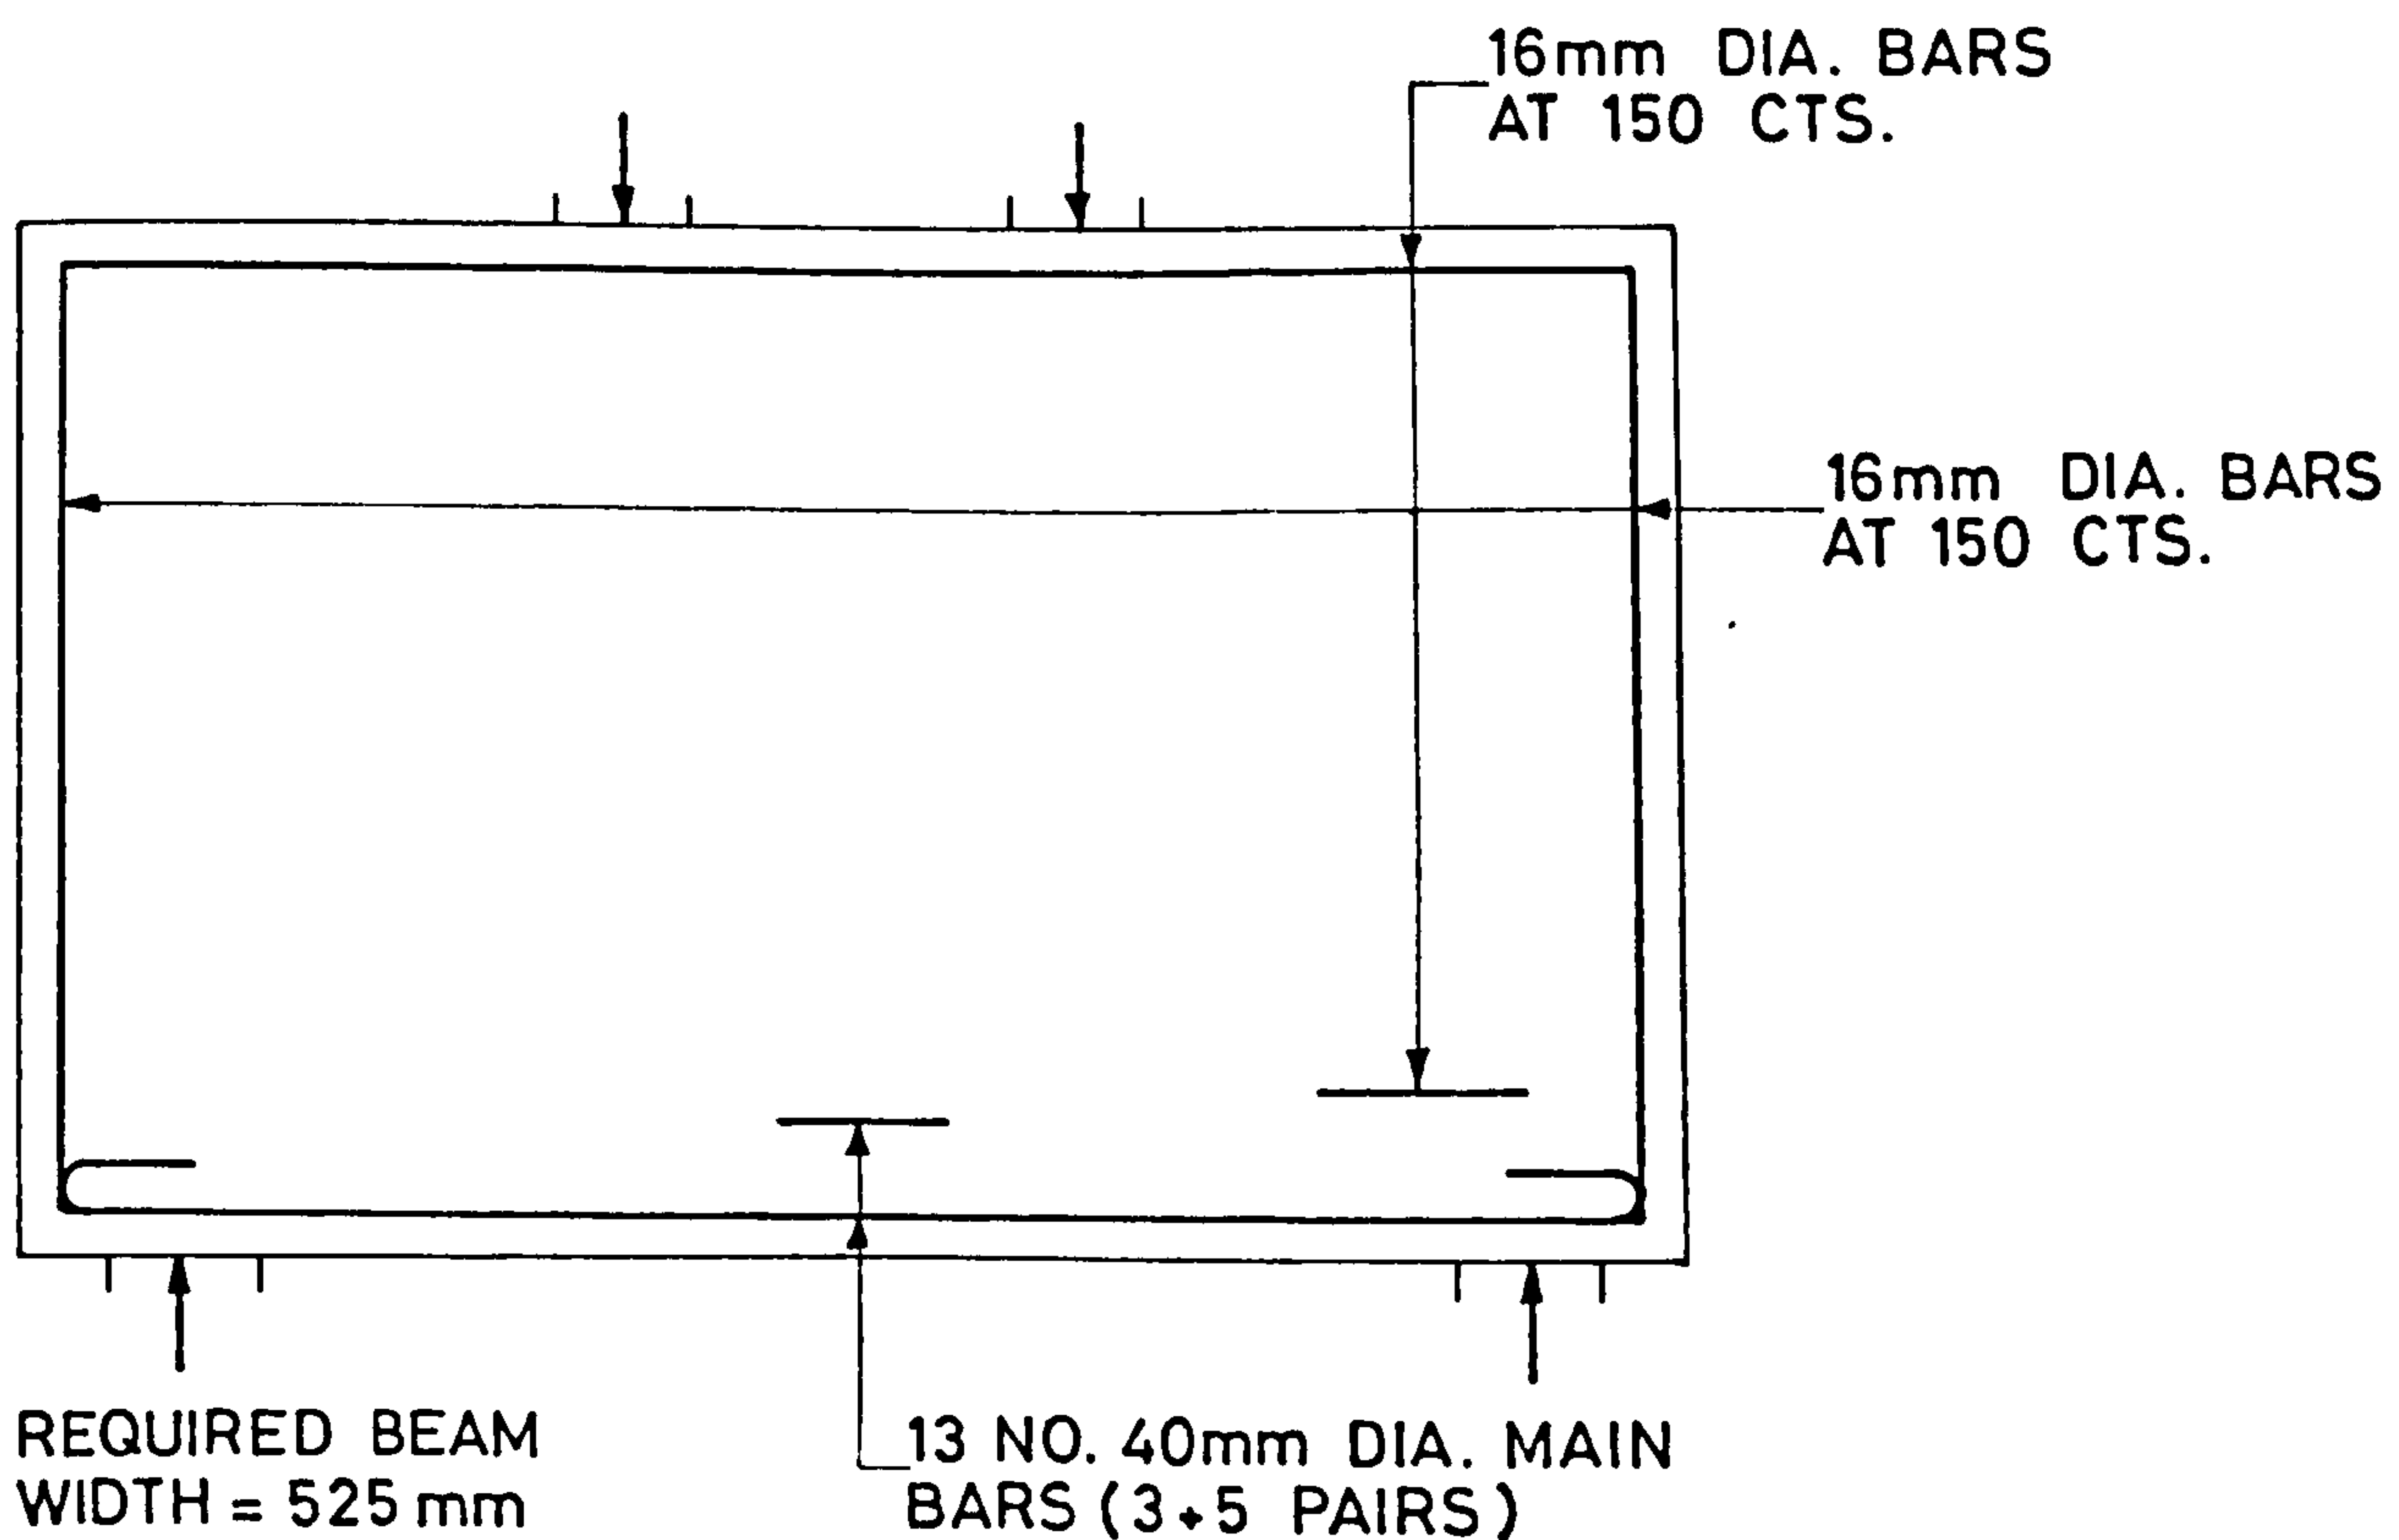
BEAM DESIGNED TO ACI BUILDING CODE
